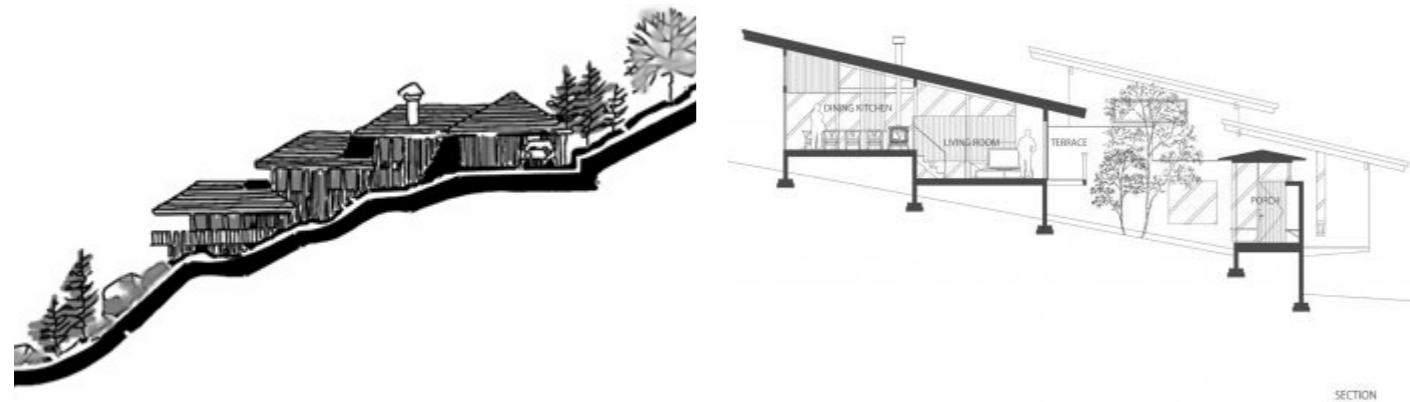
Split level floors on/in ground recommended (L) and split floors on stilts not recommended (R)
